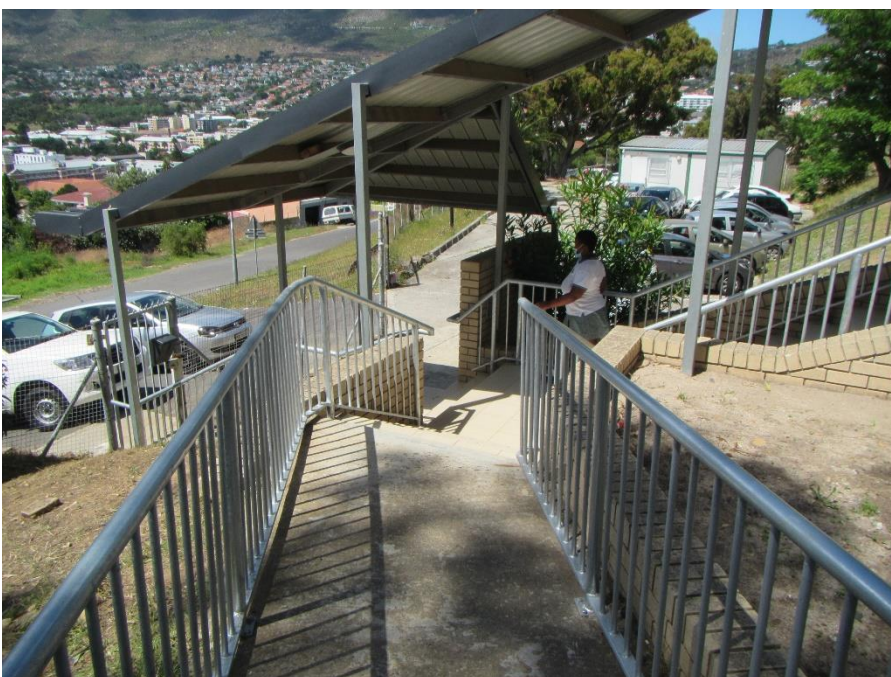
B after: (Staircase 1) addition of steel handrails and balustrades on external stairs and walkways.
